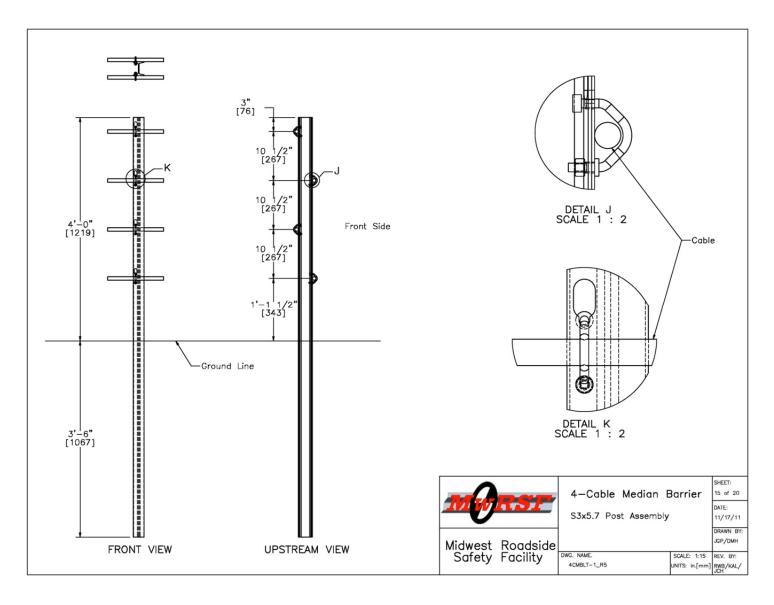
Post Assembly Layout, Test No. 4CMBLT-1
